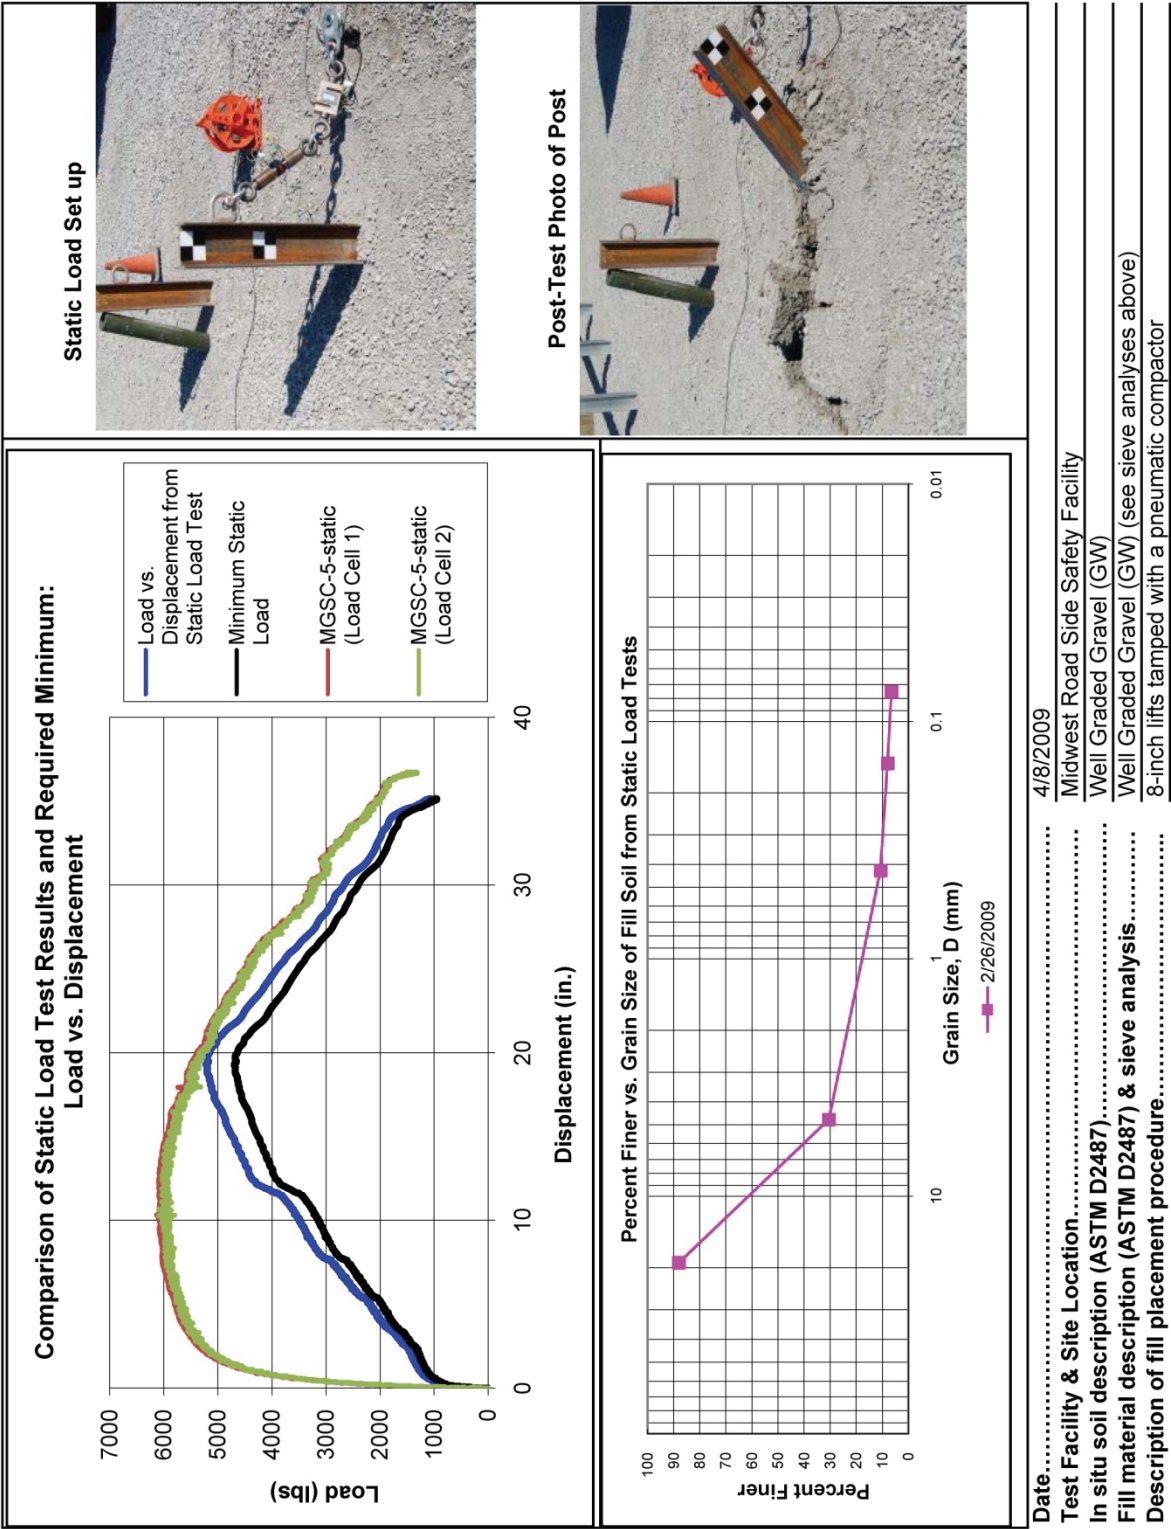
Static Soil Test, Test No. MGSC-5 Static
